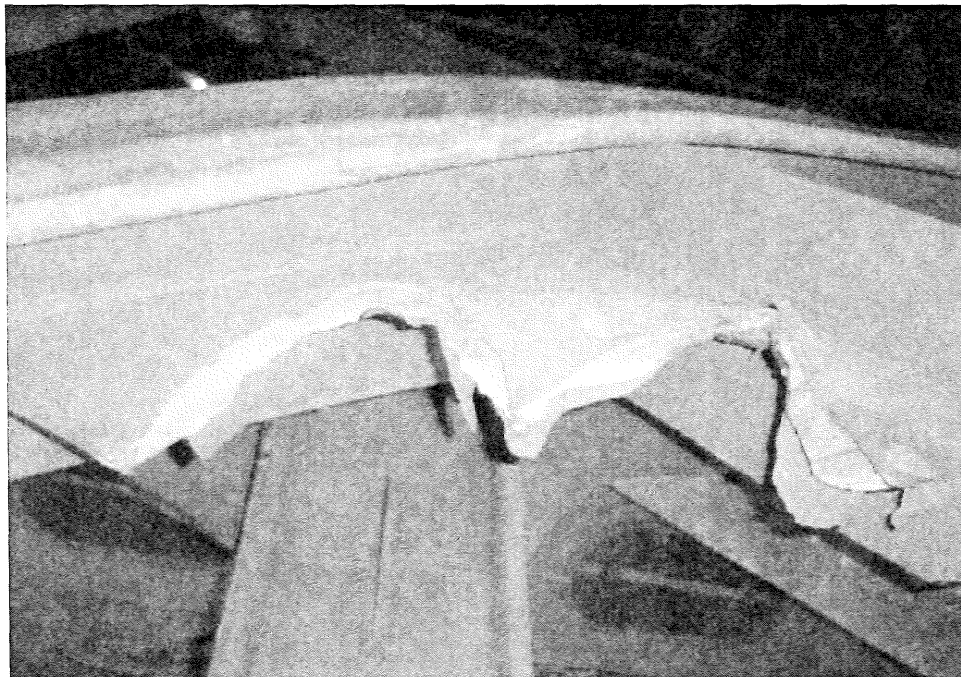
Fracture in gusset around floor truss diagonal (FT7U10).
